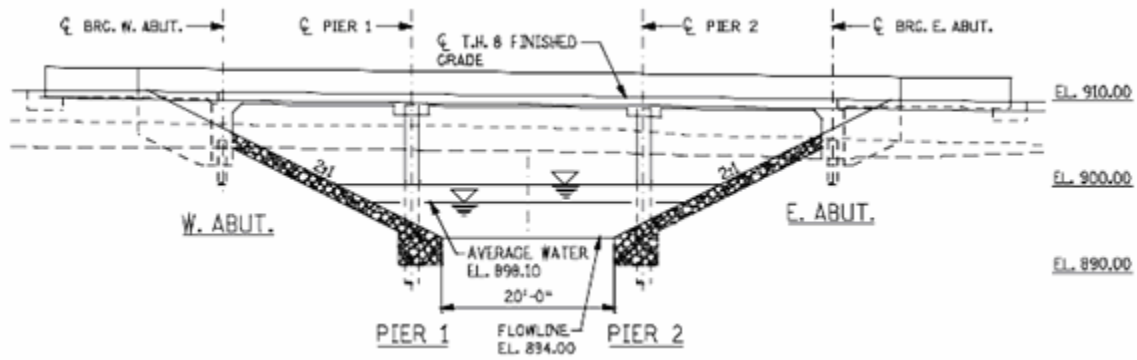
Elevation view of Mn/DOT Bridge No. 13004 (Hagen, 2005)
